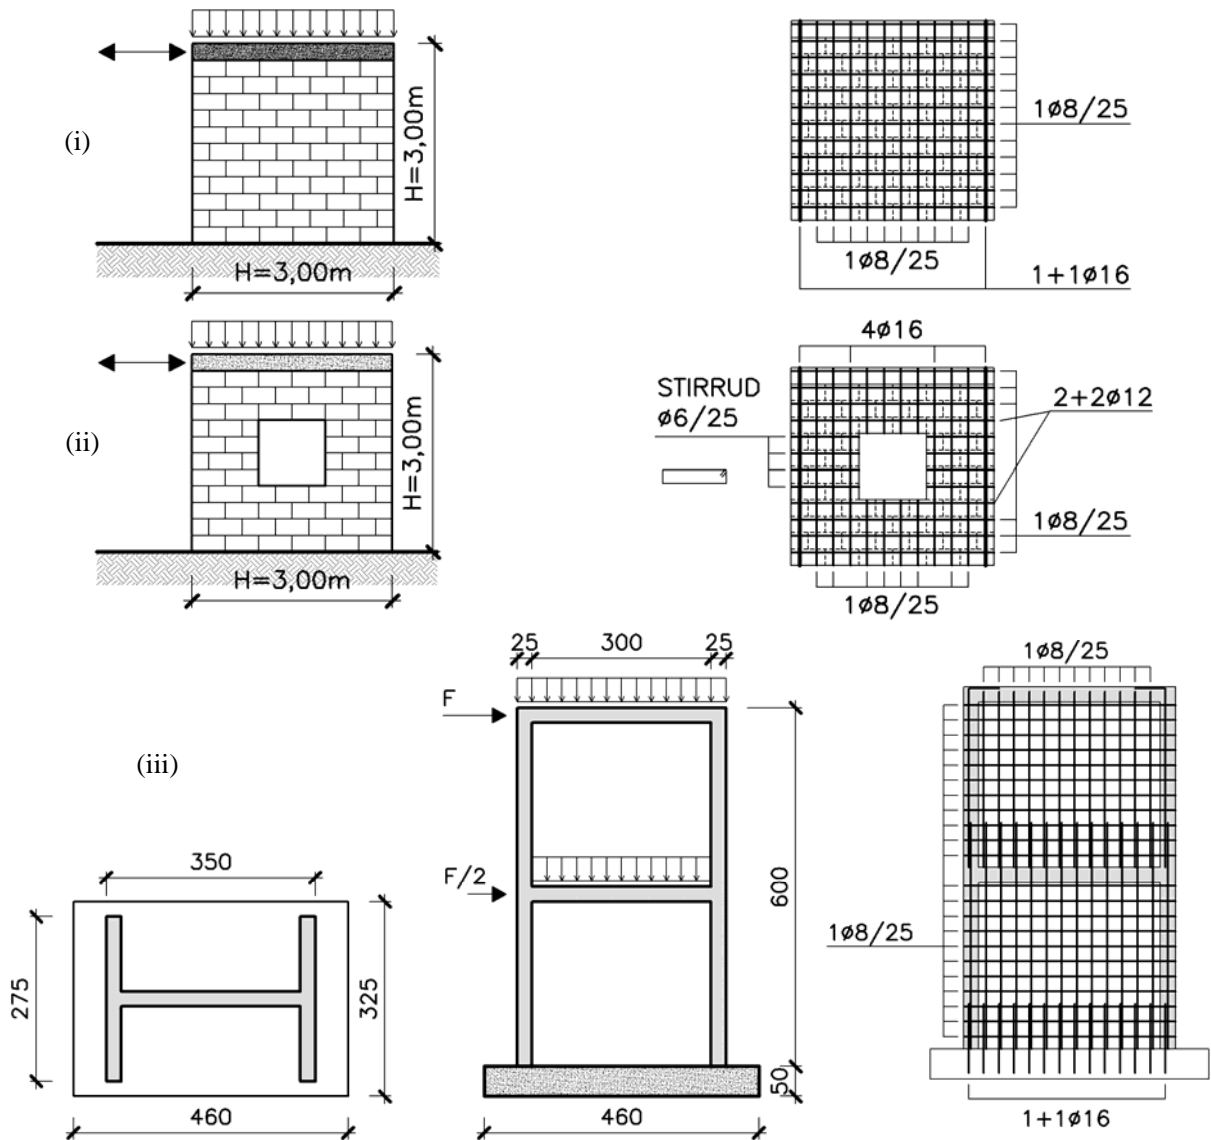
Geometrical and reinforcement characteristics of the tested specimen; (i) wall without opening, (ii) wall with opening and (iii) two storey H shaped structure.
